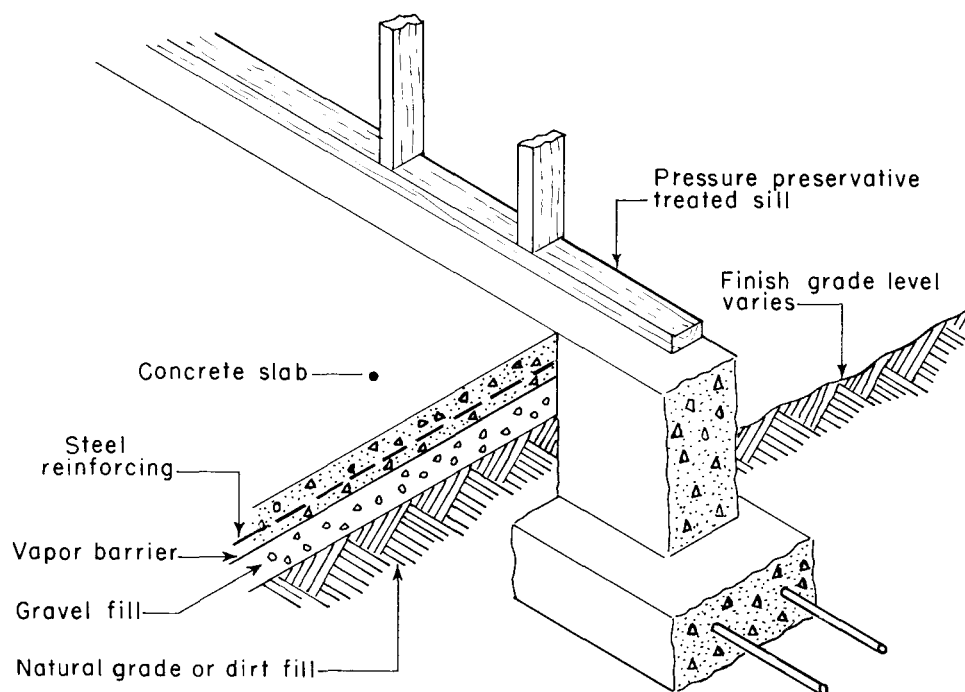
The concrete slab floor is often used in homes in the Southwestern United States.
